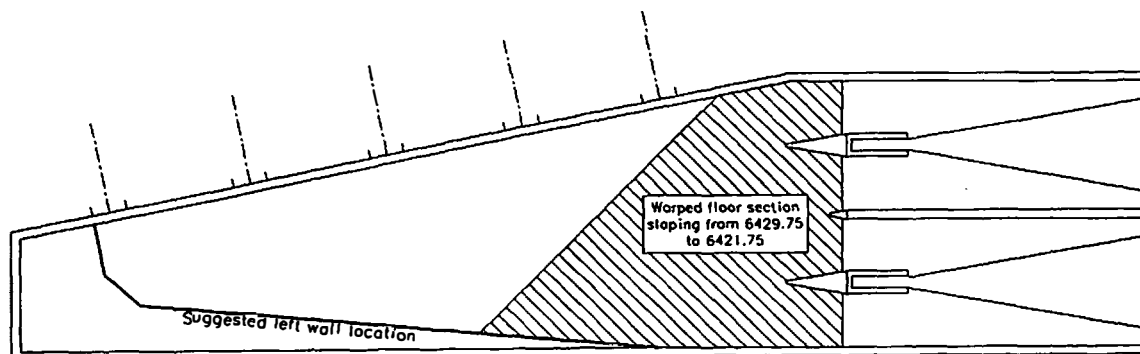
Suggested configuration of the main pumping plant sump, showing changes to the left and downstream walls, floor transition entering the sump, and streamlining of structures upstream of the sump.
